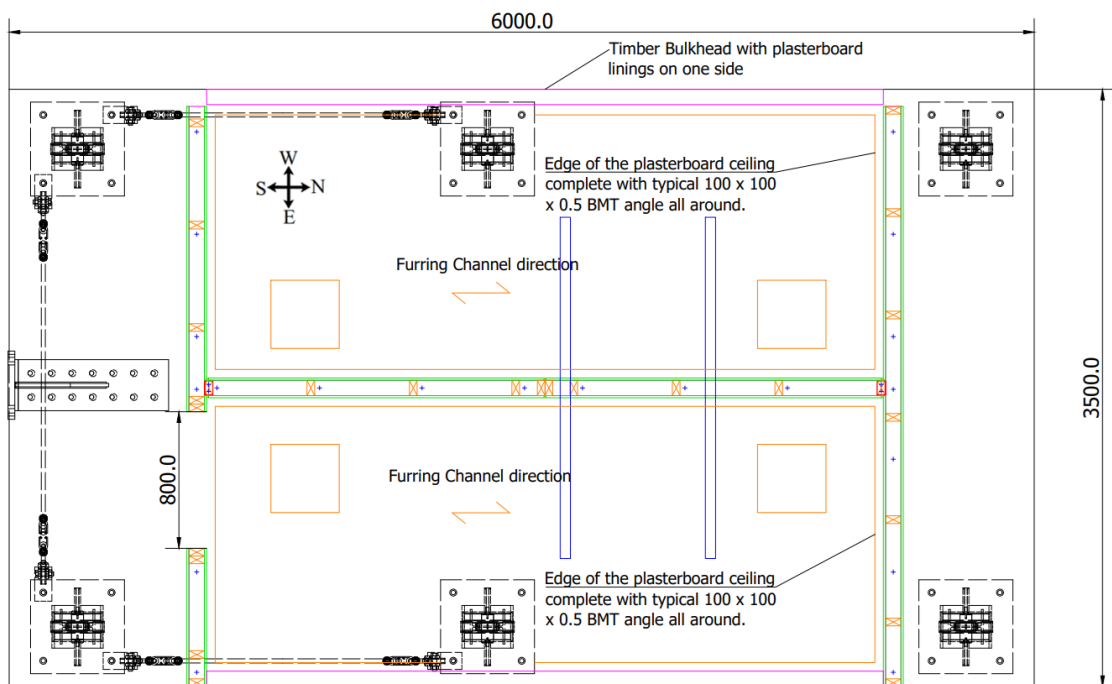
Area of ceiling installation with intended perimeter joint details (plan).
